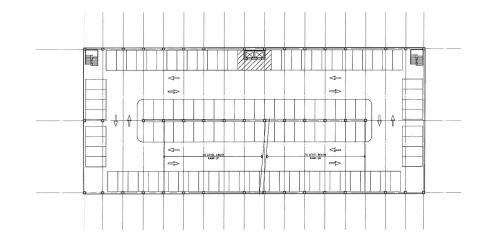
City-Funded Test Case 2—Parking Layout, Plaza 2
